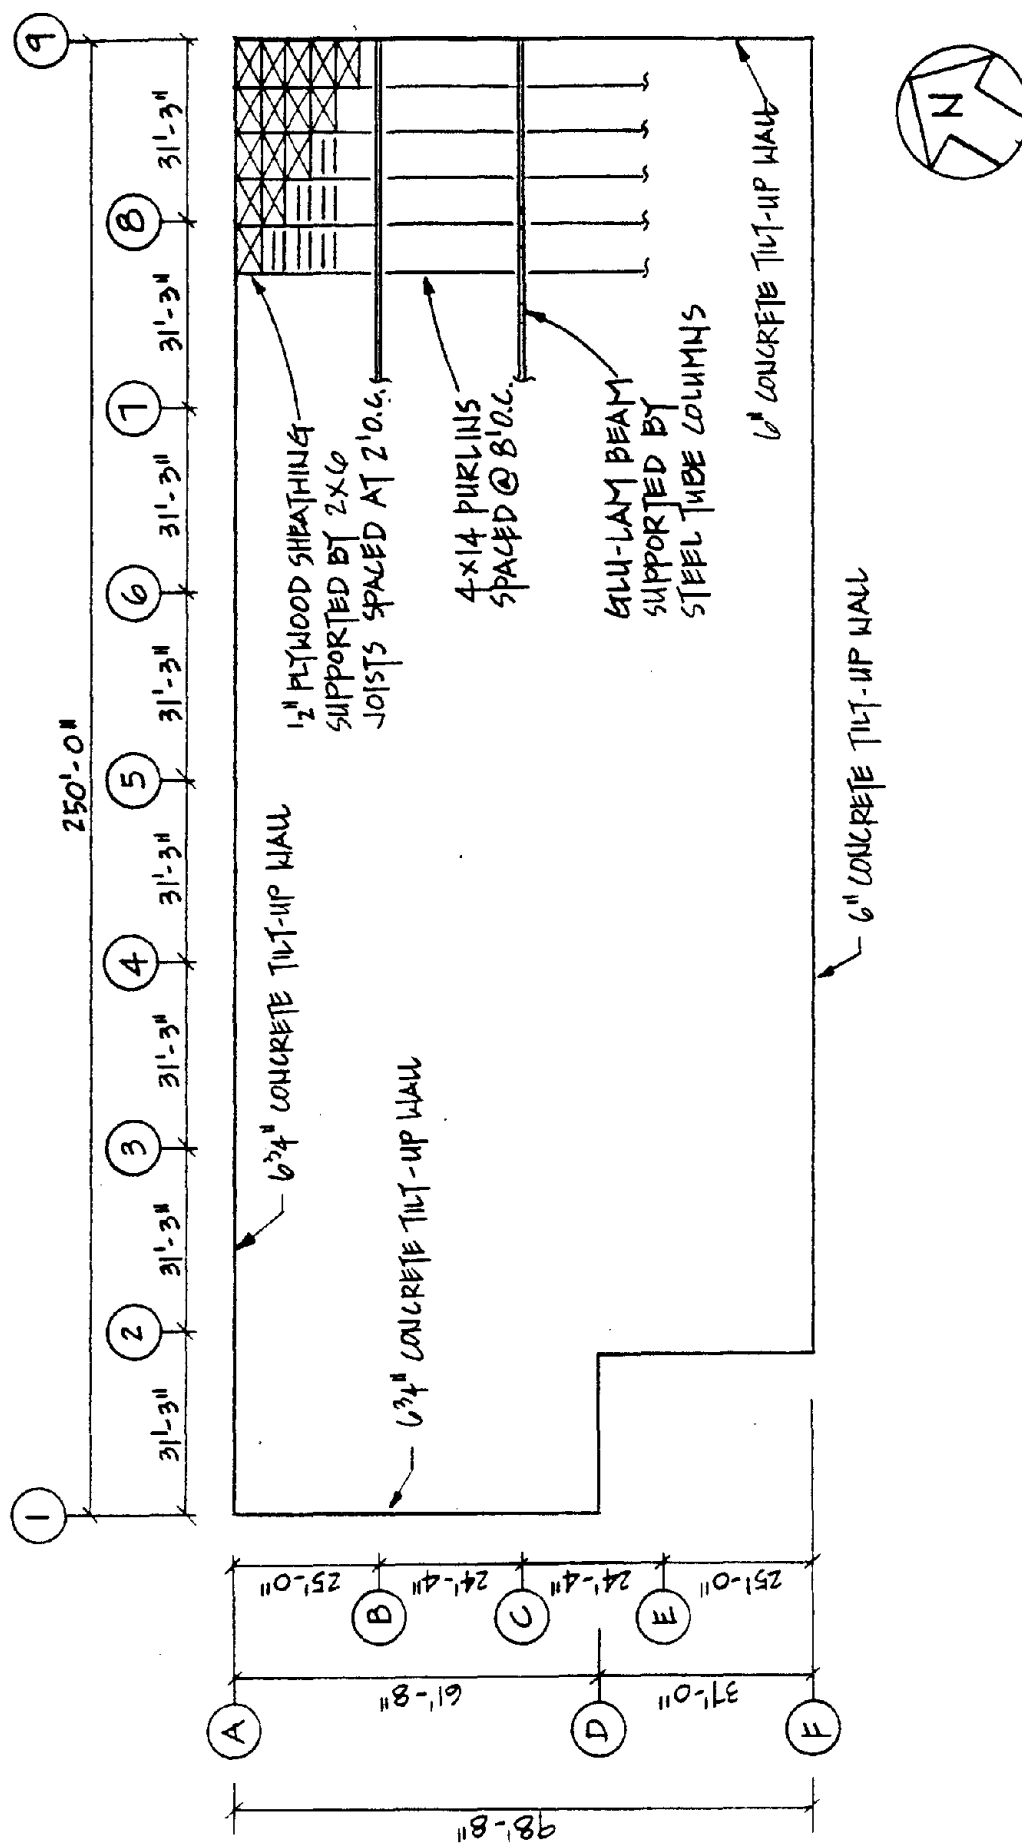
Roof Plan of the 120 Mast Street Building
